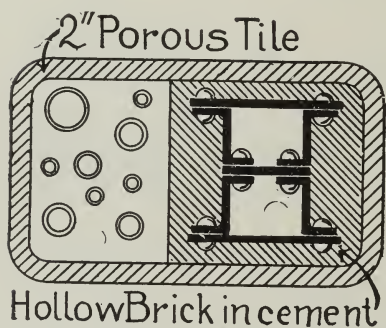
Column and Pipe Covering in Monadnock Building, Chicago.
